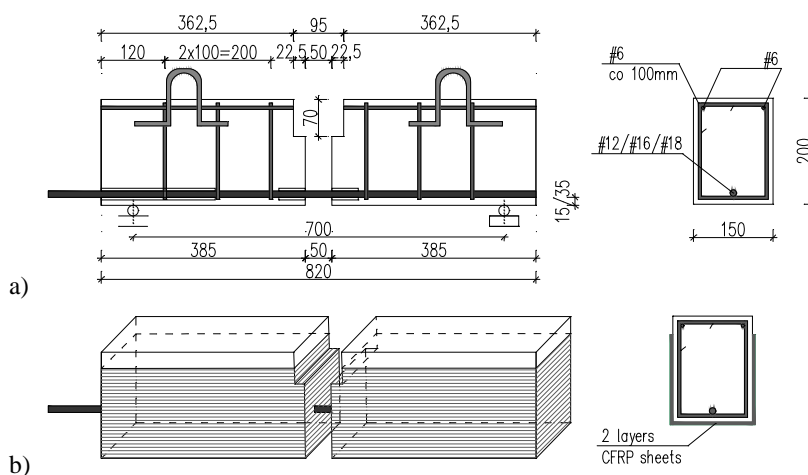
Reinforcement of beams and additional 2 layers of CFRP strengthening (lateral and bottom fibres in horizontal direction).
